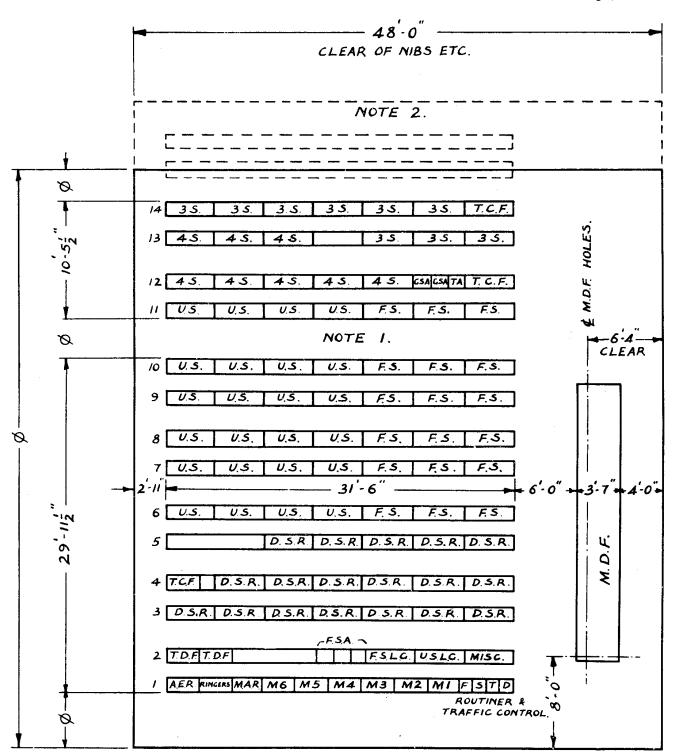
TYPICAL BRANCH EXCHANGE LAYOUTS.
